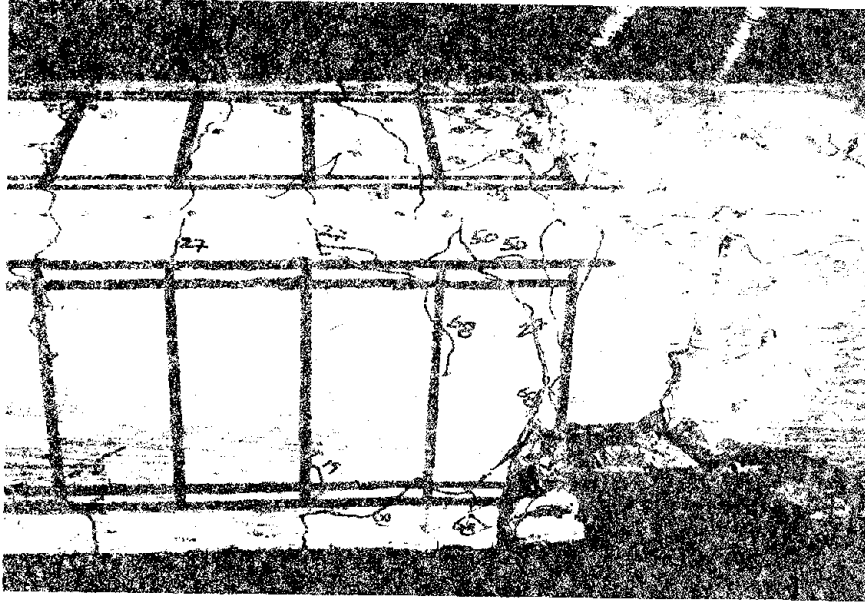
Localized damage outside splice end in specimen C-3 with little deterioration along splice.
